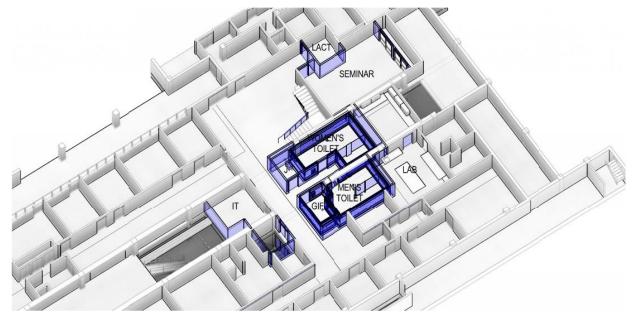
Phasing Diagram New Floor Plan, Level 1
